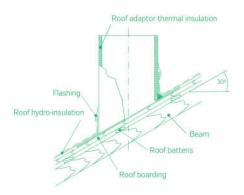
CONNECTION OF THE AIR-HANDLING DUCT
